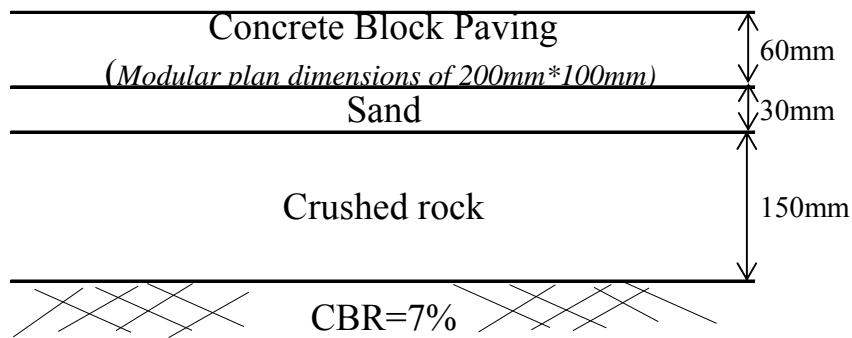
Pavement Structure for Terminal Walkway
